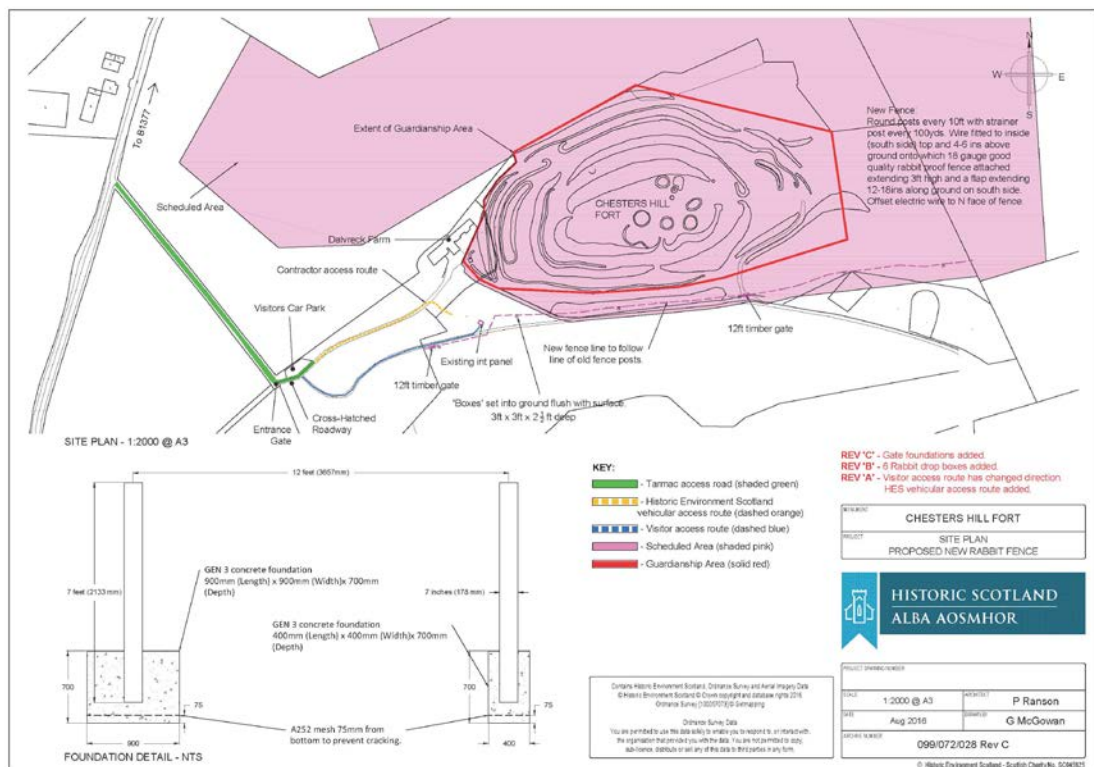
Plan showing the location of the new rabbit –proof fence and drop boxes
